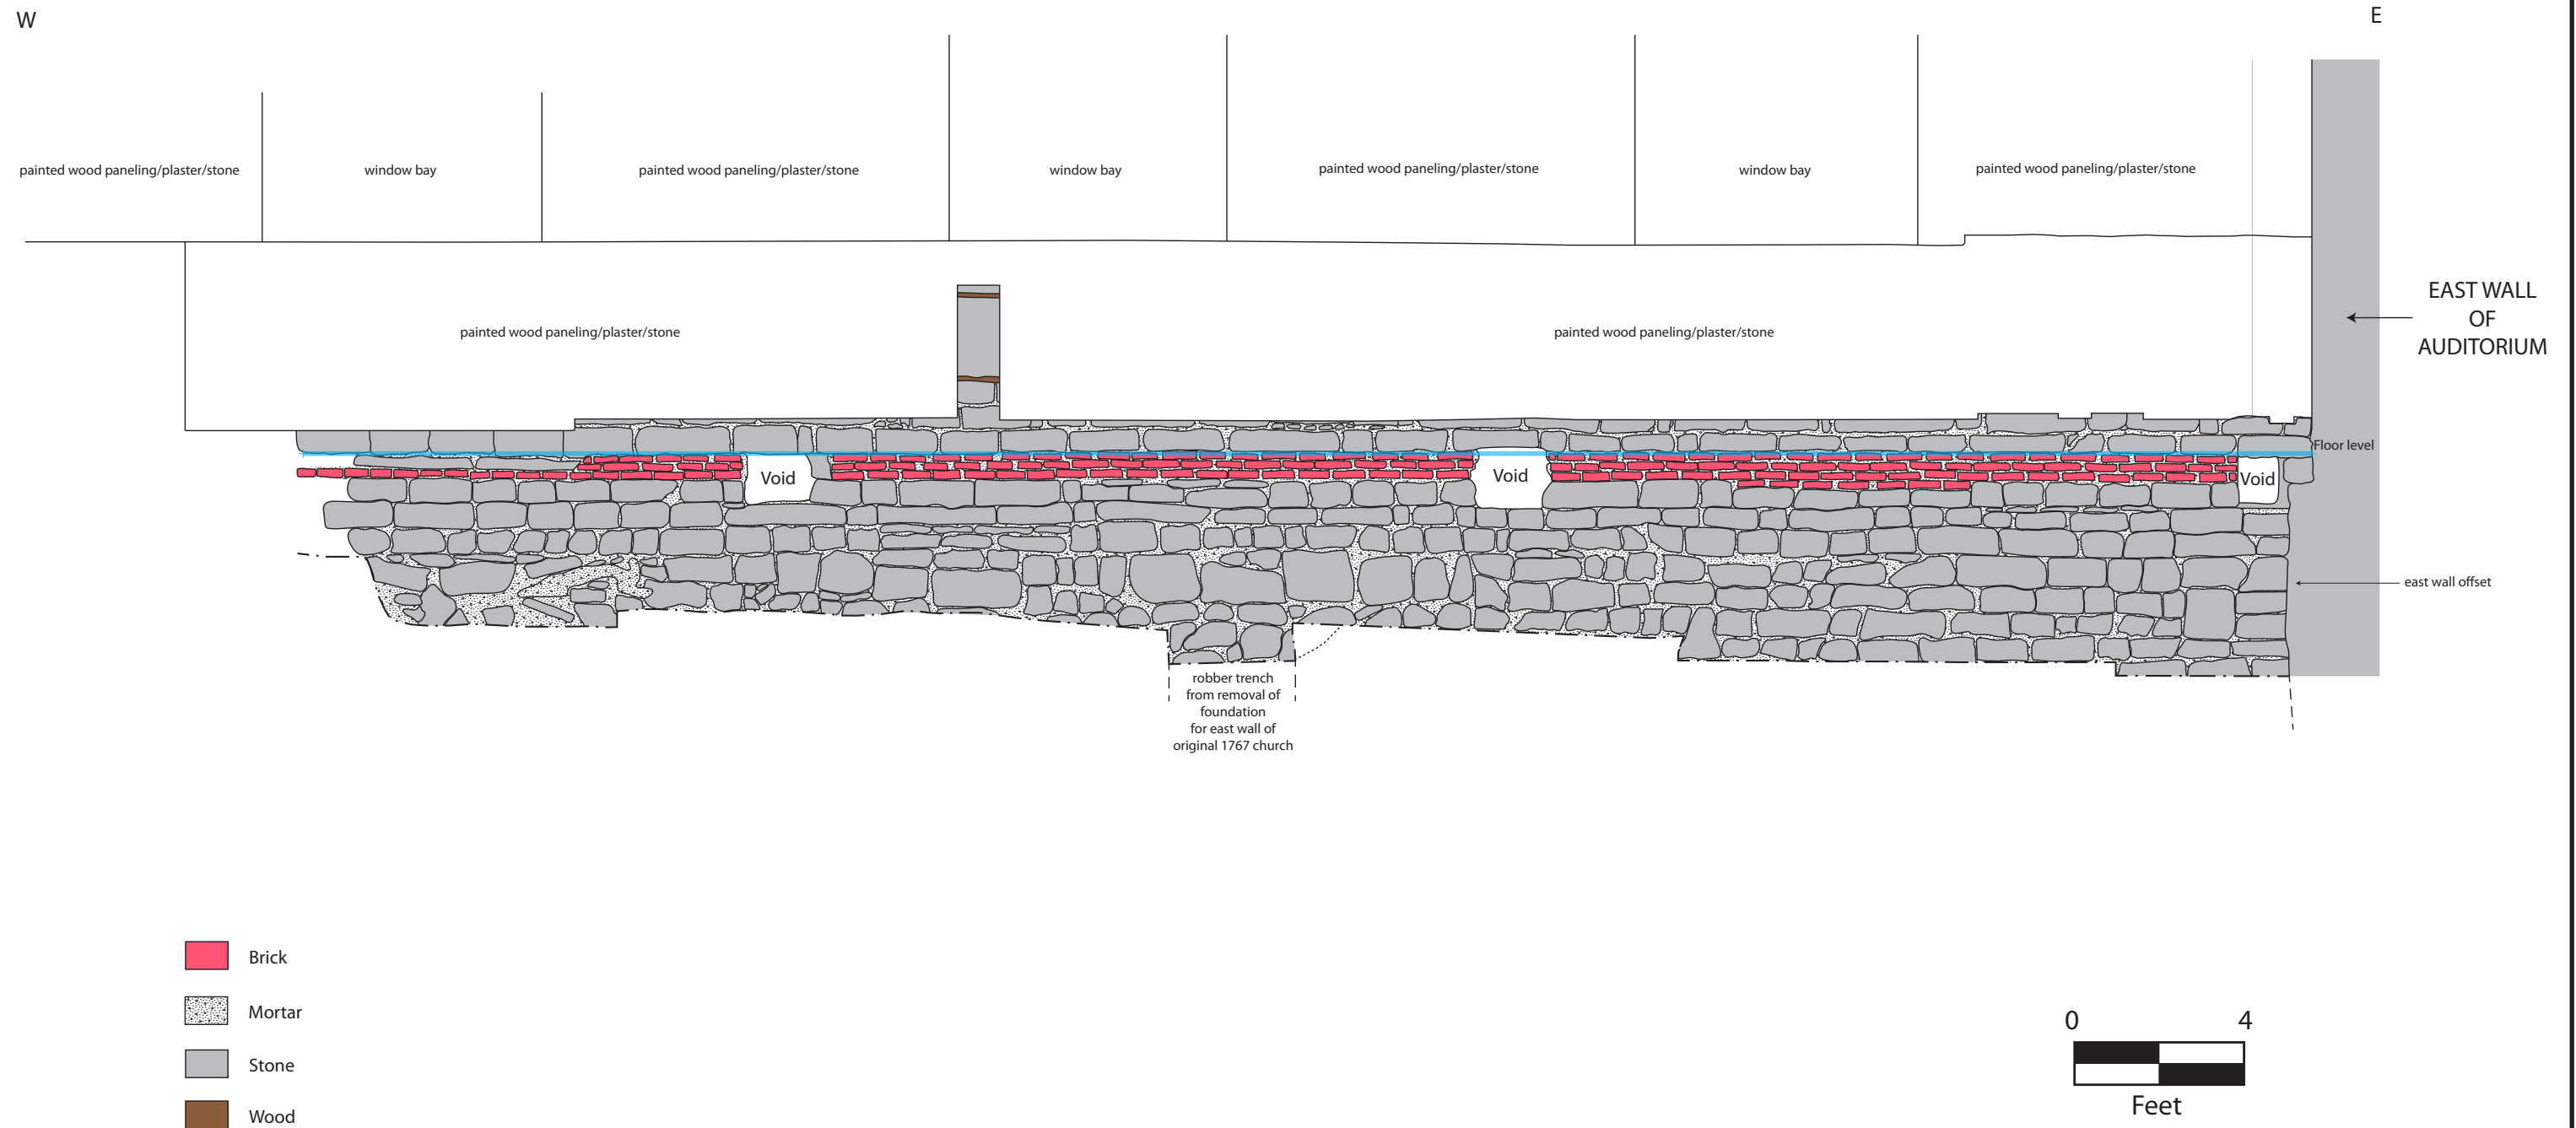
Church Interior, North Wall Elevation in Trench 1.
